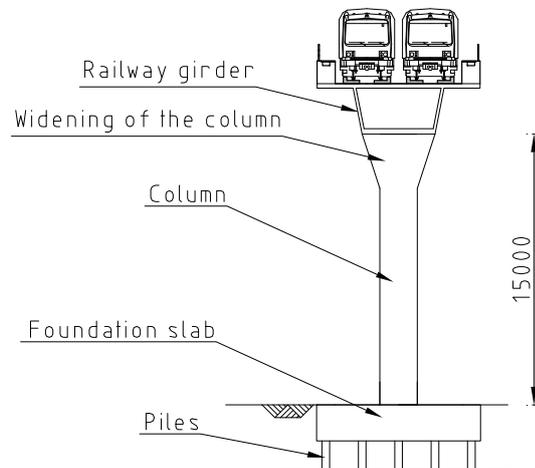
Schematisation of the elevated metro structure with a concrete box girder
